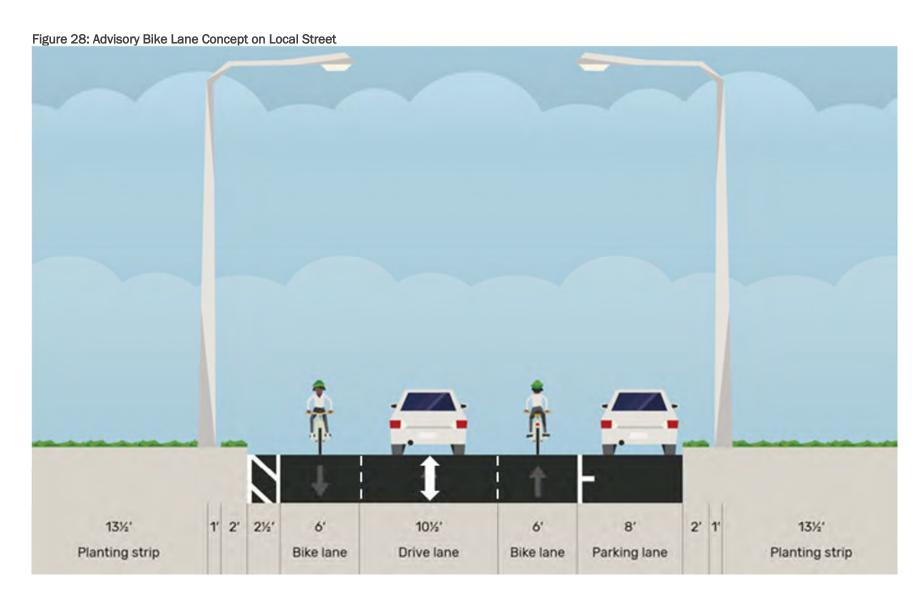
provides a conceptual cross section of how advisory bike lanes might be applied to a low-volume local street in Brandon. In this example, on-street parking is removed or restricted on one side to make room for advisory bike lanes.
